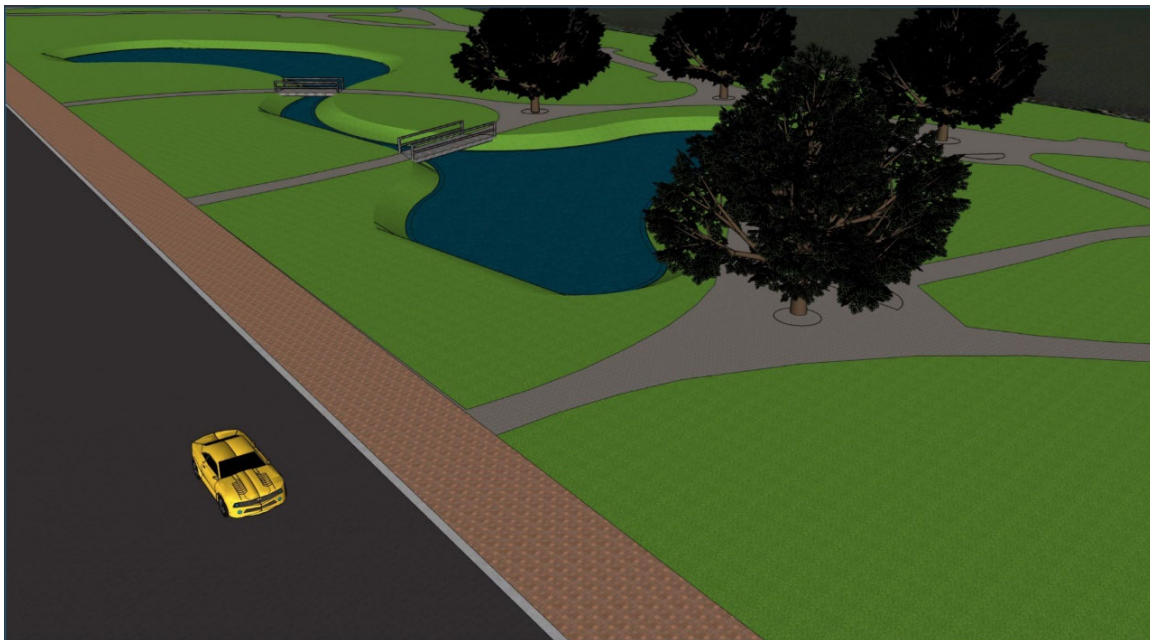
Sketch-Up Drawing Shows Proposed Locations for Bioretention at Founders Park
